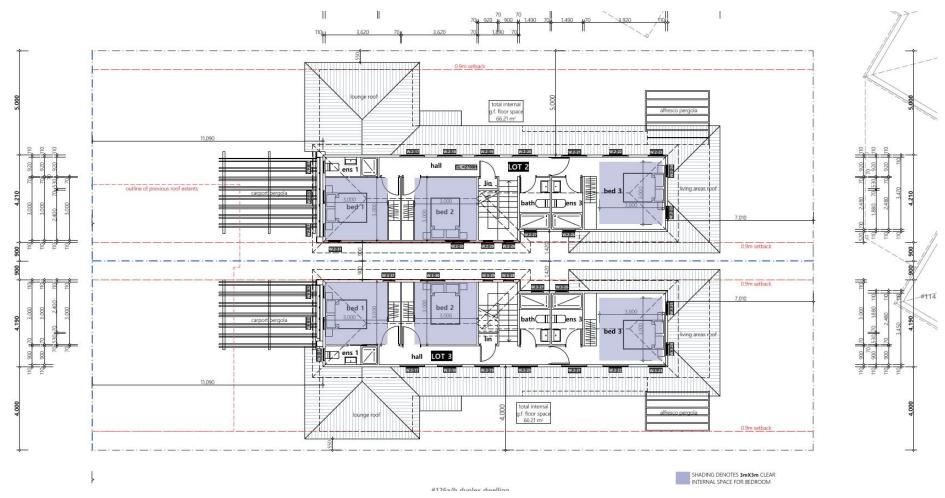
Lot 2 & Lot 3 Proposed Internal Layout – First Level
